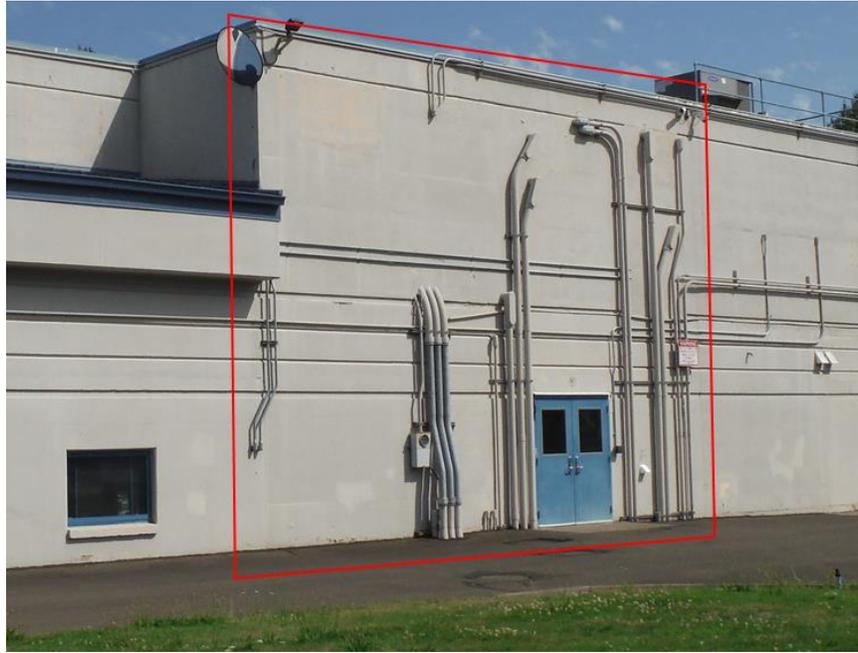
Original Treatment/Control Building (pre-1961)
